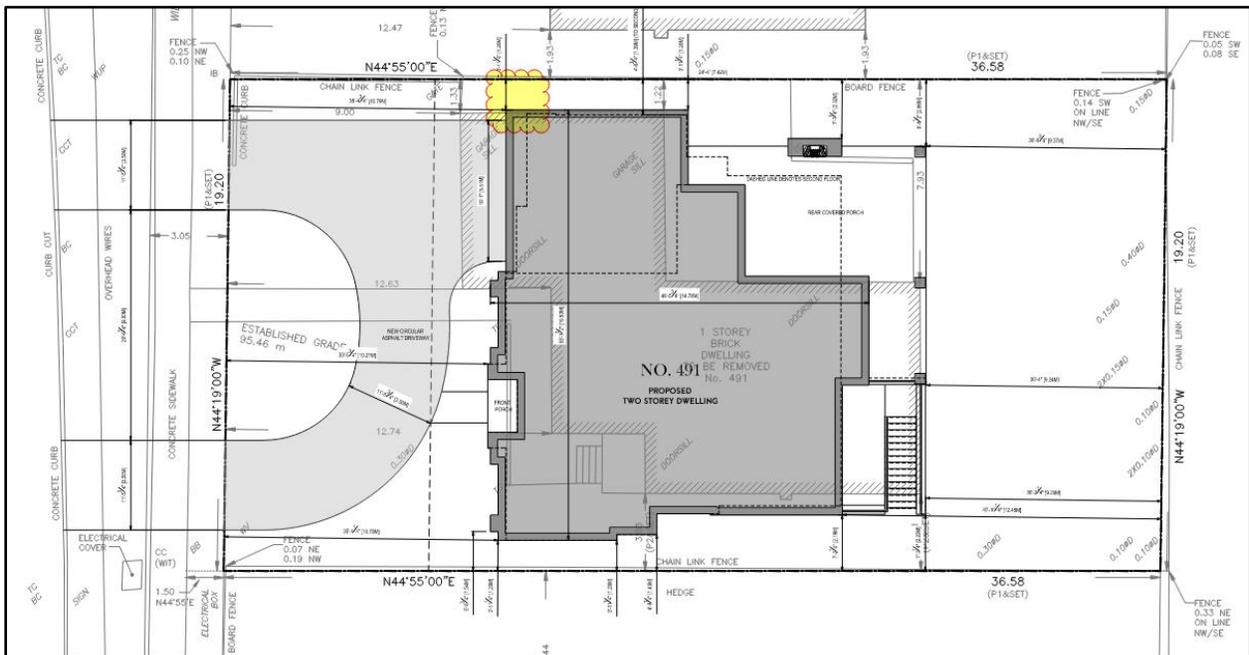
491 Fourth Line Site Plan (2<sup>nd</sup> Submission)
